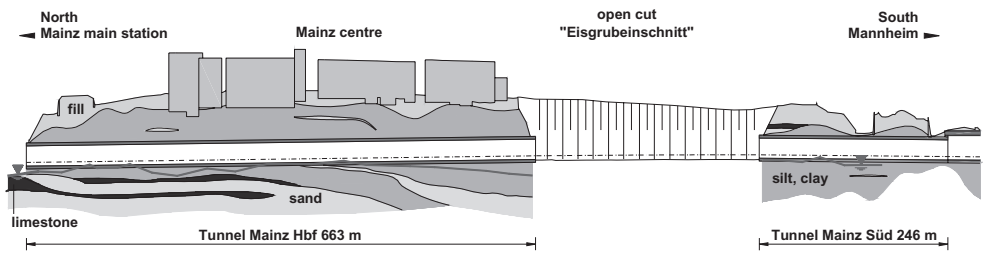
Geotechnical longitudinal section—Old Tunnel Mainz.
